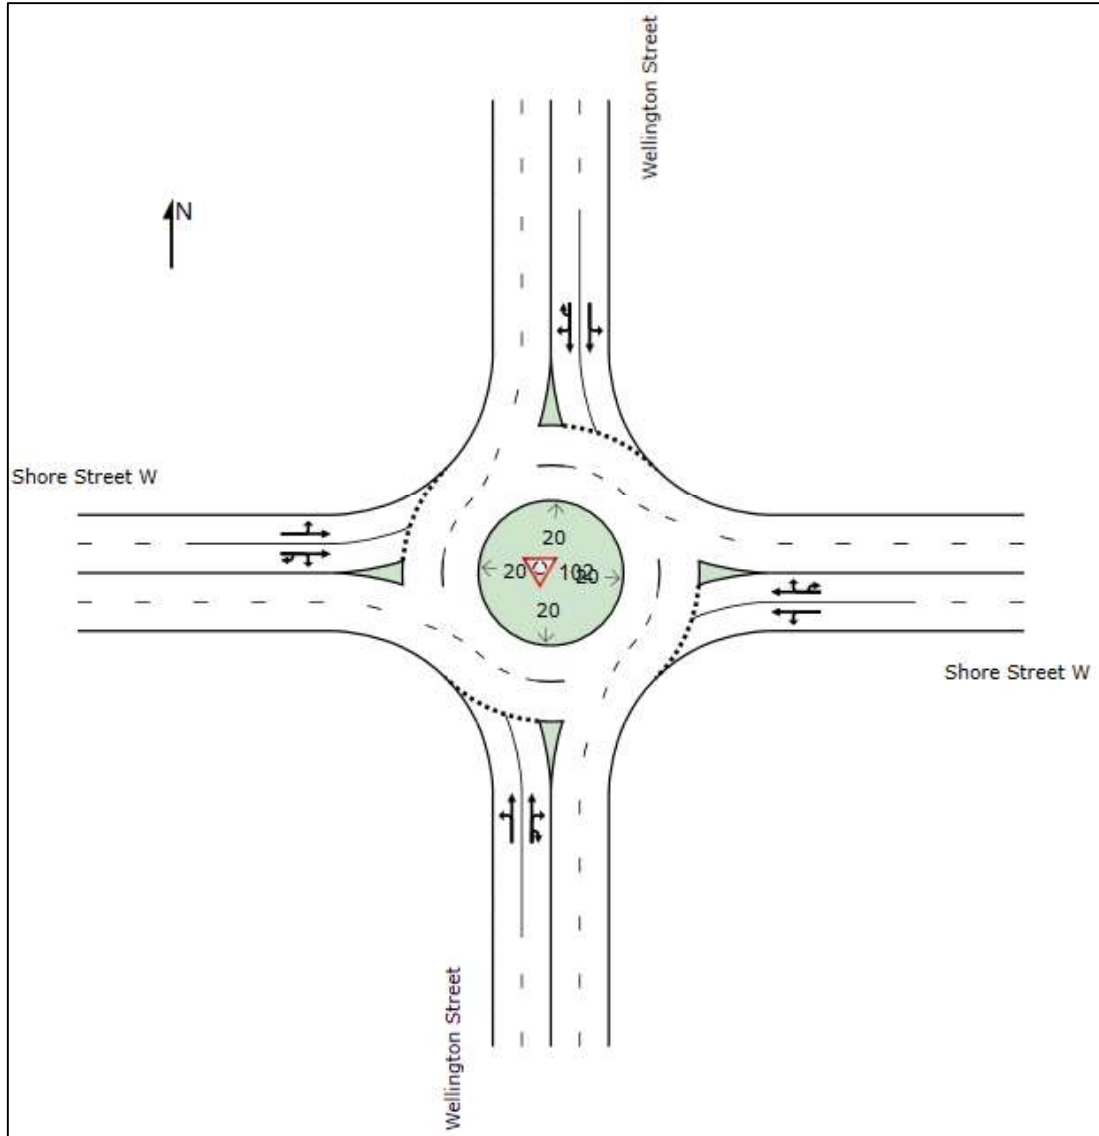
Shore Street West / Wellington Street Roundabout – SIDRA Layout
